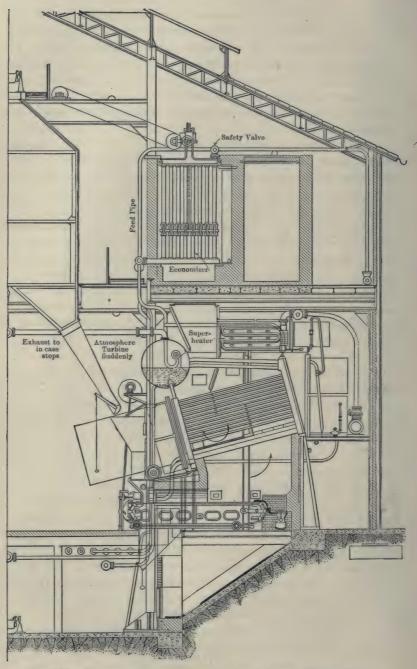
SECTION THROUGH ONE-HALF OF A LARGE BOILER PLANT.
